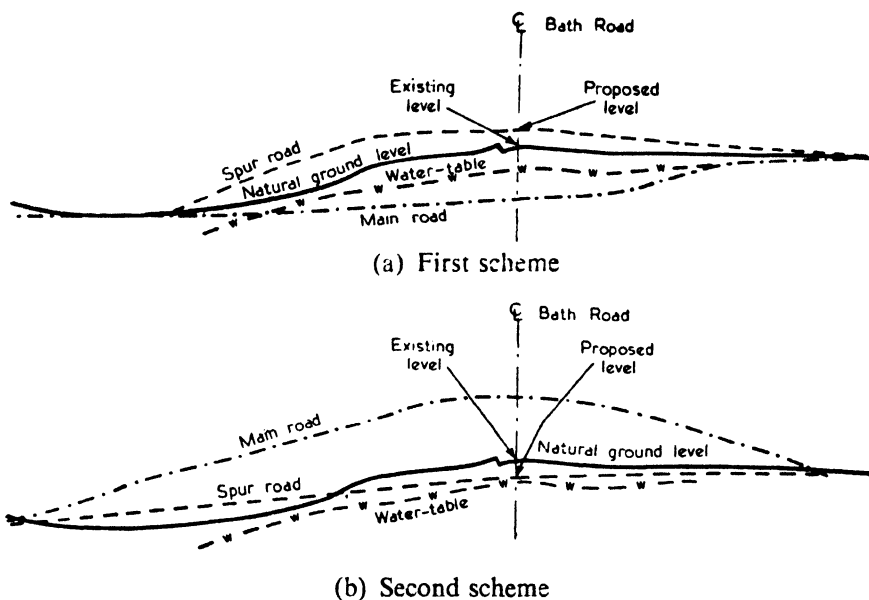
LONGITUDINAL SECTION ALONG PROPOSED NEW ROAD
